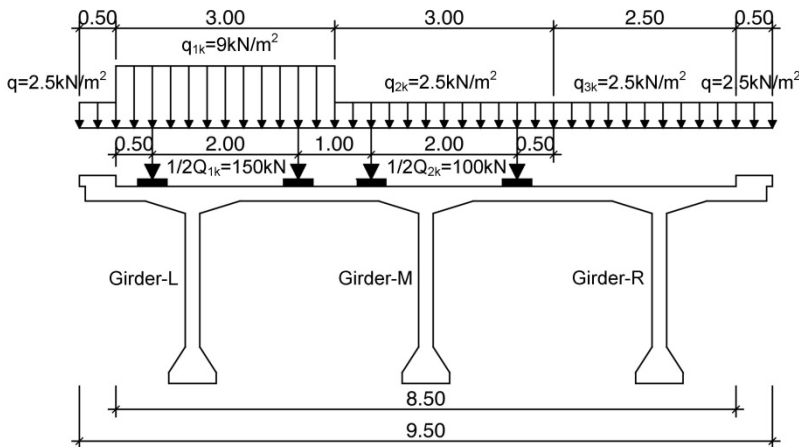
Arrangement of highway live load in NTC 2008 in transverse direction
